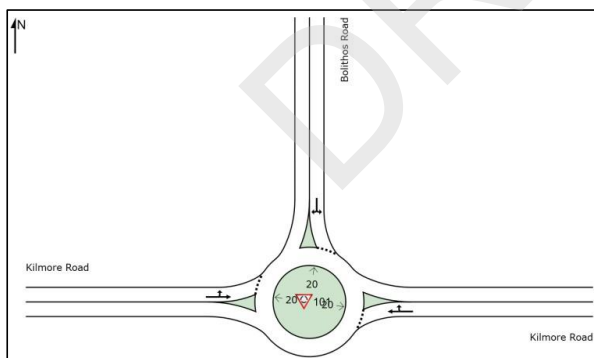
Model of the proposed roundabout at the intersection of Kilmore Road & Bolithos Road
